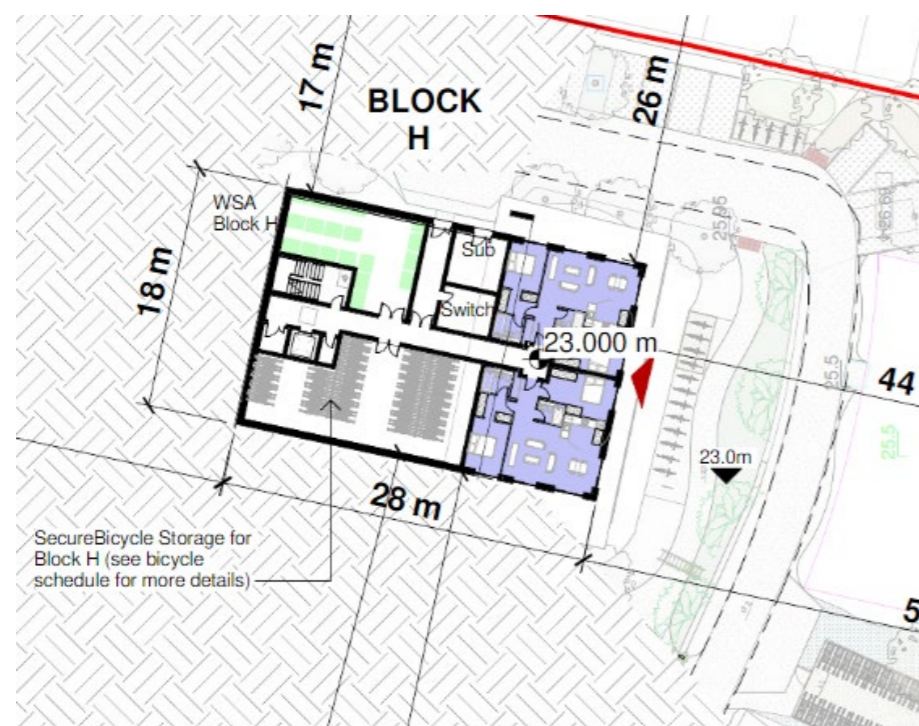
RAU Drawing showing cycle entrance to Block H at grade. (Source: RAU Drawing GA-Site-Proposed Lower Level MKS-RAU-ZZ- -1-DR-AR-051 Rev P02.)
